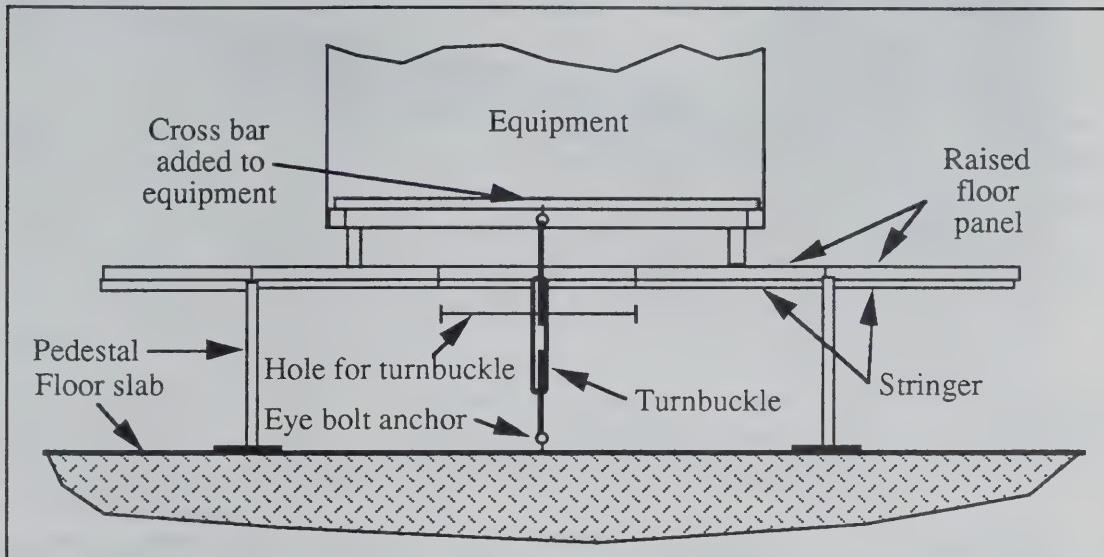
Toggle-link system for restraining equipment on raised floors.
